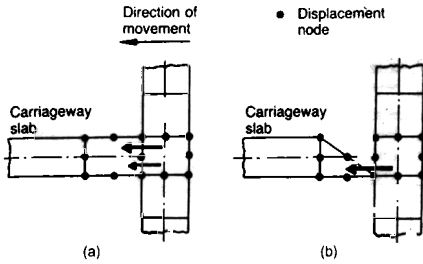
Detail of joint between wall and permanent slab: (a) rigid connection; (b) pinned connection
